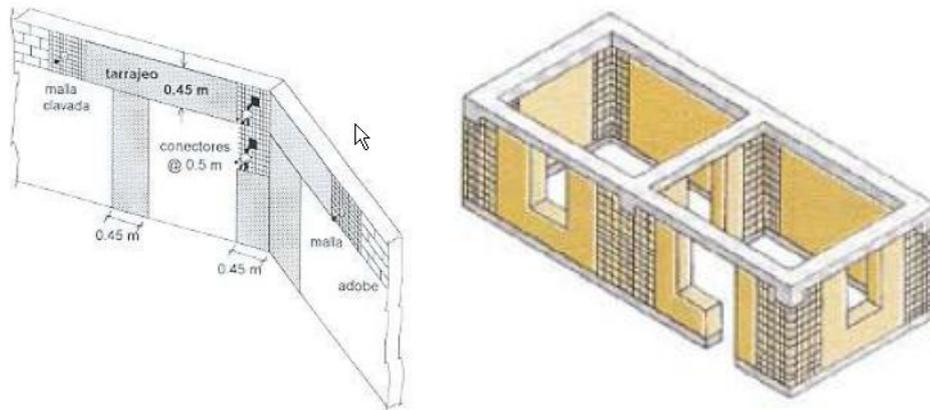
Wire mesh reinforcement. After Blondet [9]
